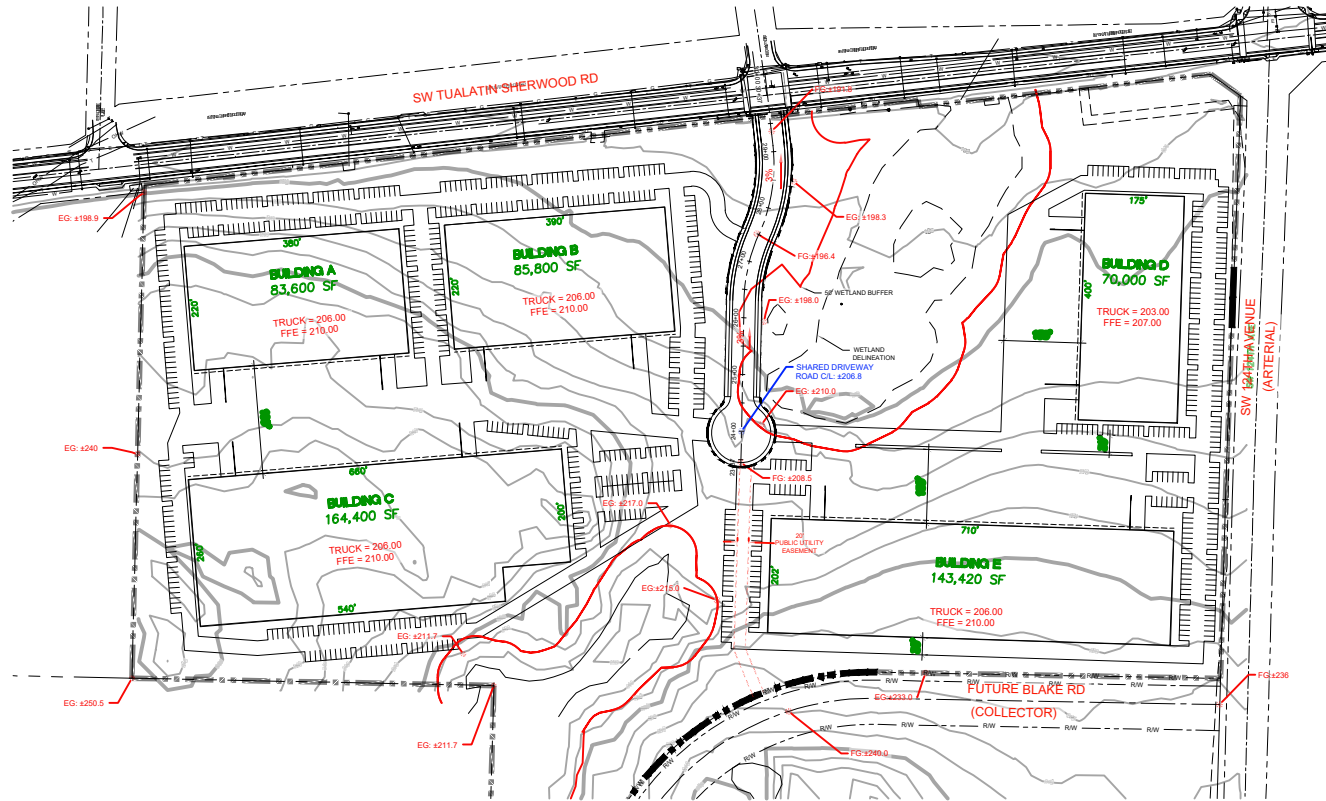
displays a site vicinity map and Figures 2 and 3 display two proposed site plan alternatives. The site plan as shown in Figure 2 details a possible extension of Cipole Road into the site terminating as a private cul-de-sac within the subject site, whereas Figure 3 shows Cipole Road bisecting the site as a public street, extending to intersect with the future Blake Road. As shown in both site plans, no site access driveways are planned on NE 124<sup>th</sup> Avenue.
